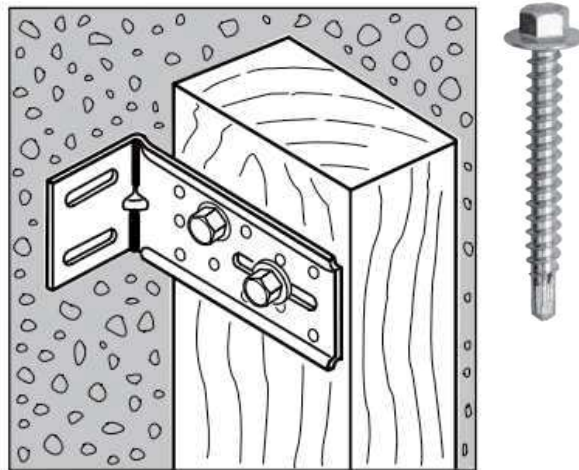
Fixing the wooden uprights to the support brackets (2 screws of $\varnothing \geq 6$)
